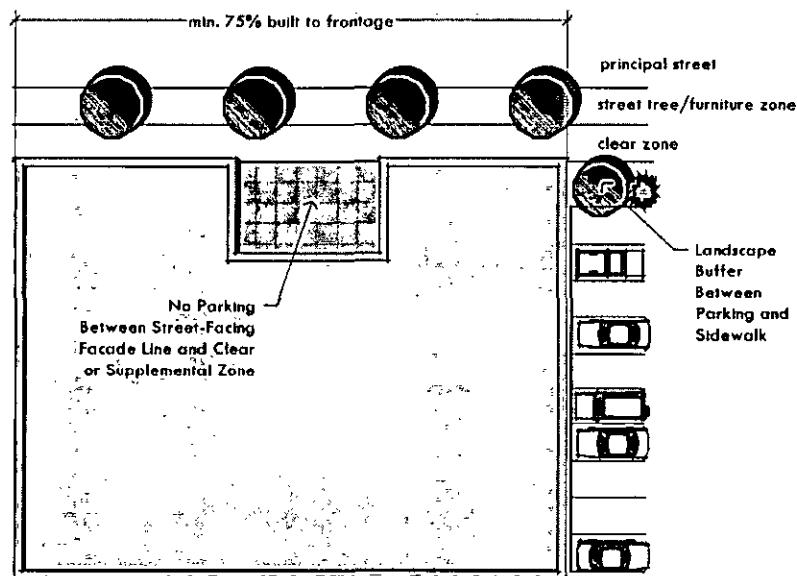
Parking to the side of a building is permitted but screening is required between the parking and the sidewalk. No parking is permitted between the building and the sidewalk on a Core Transit Corridor.
